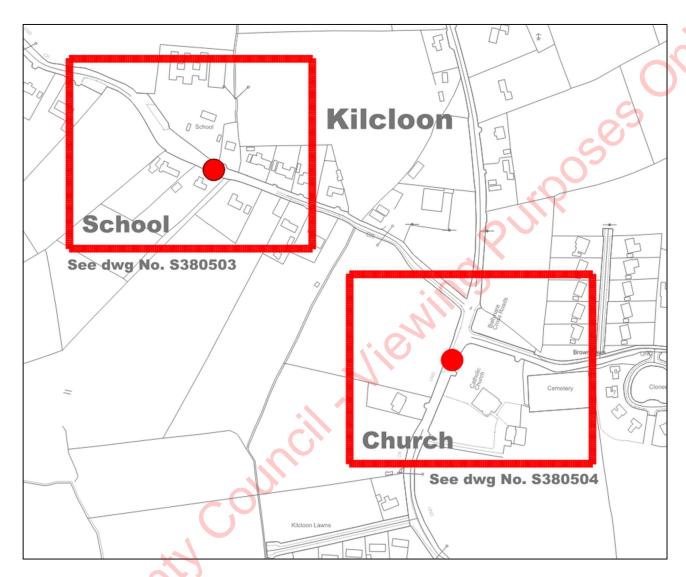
Proposed Site Location of Kilcloon Traffic Calming Scheme
